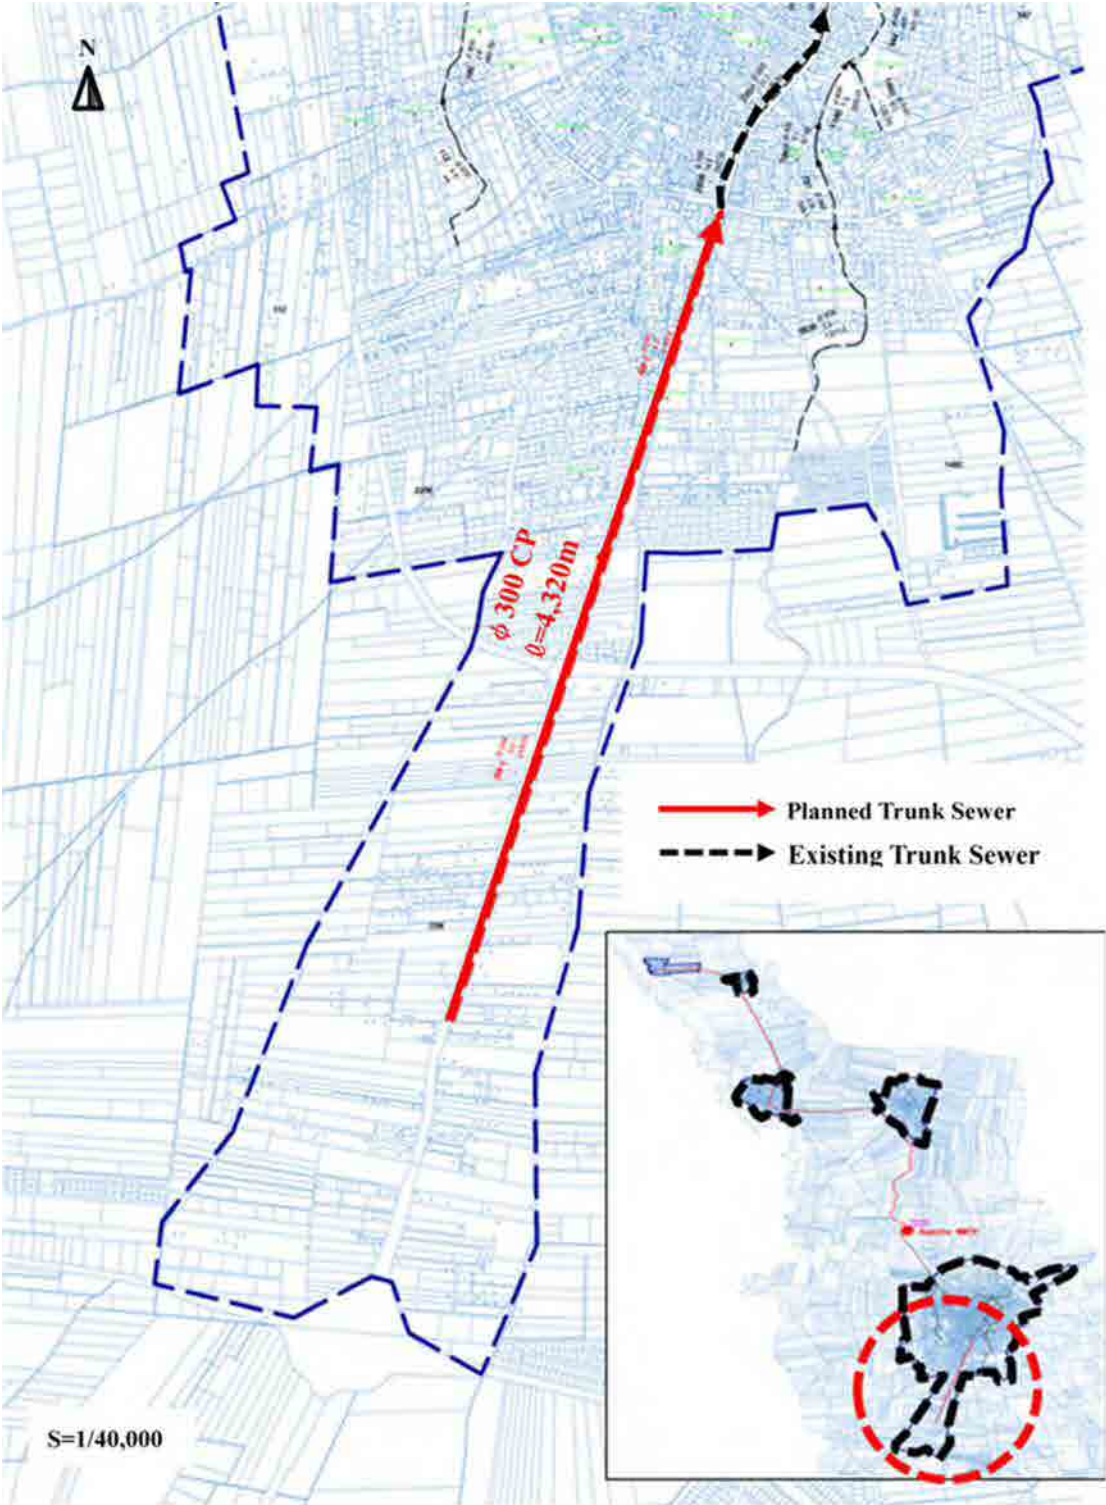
New Trunk Sewers in Ramtha SWD (2)
